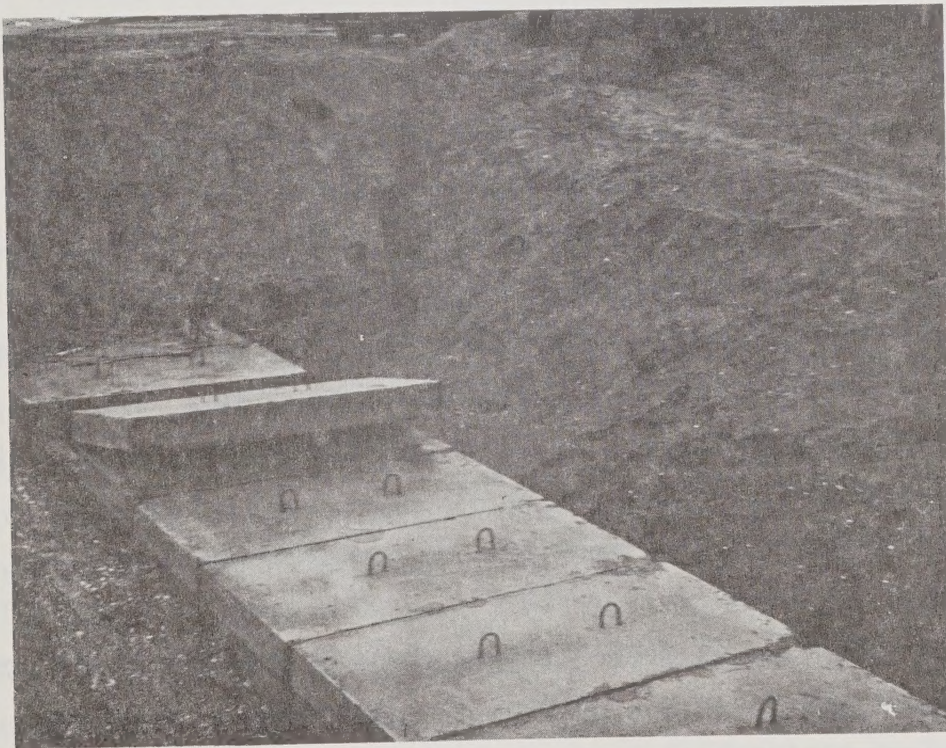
CONCRETE UTILIDOR WITH REMOVABLE TOP SECTIONS
